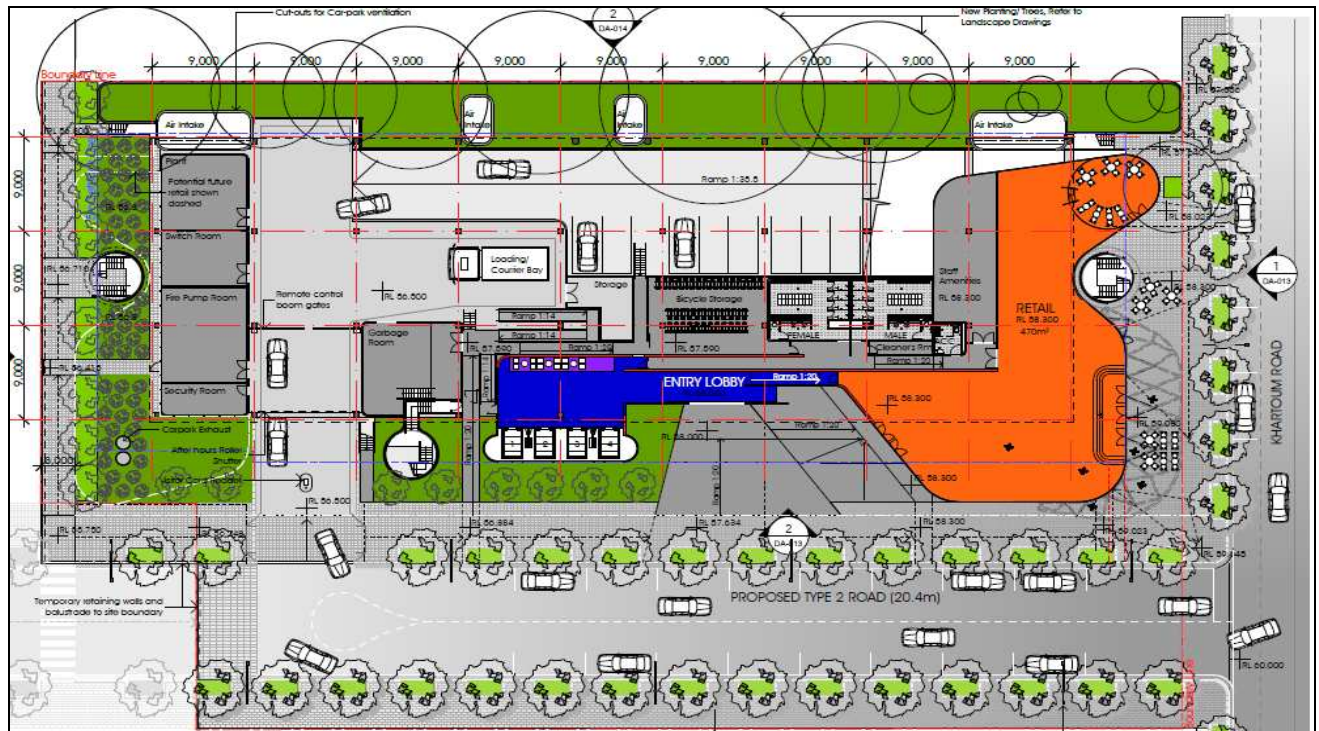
Proposed Ground Floor Plan (including the proposed road).
